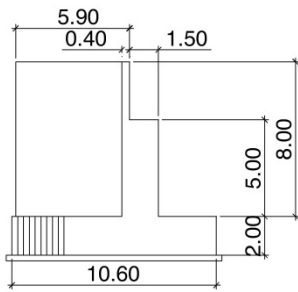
Pier cross section in 'Viadotto Serrone' (Unit: m)
